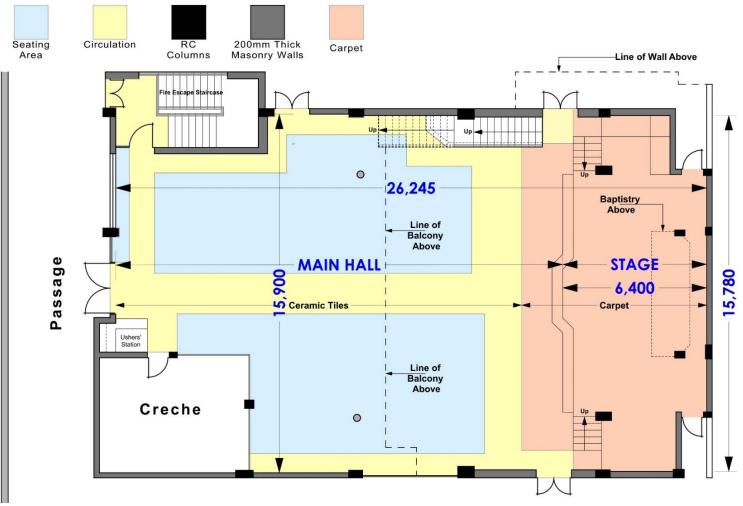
CITAM Parklands ground floor plan. Copyright: Author.
